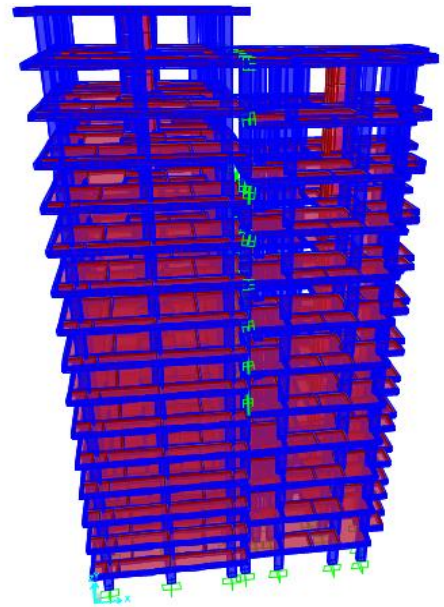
3D View of G+15 building with 3.2m floor to floor height & G+11 buildings with 4m floor to floor height without FVD
